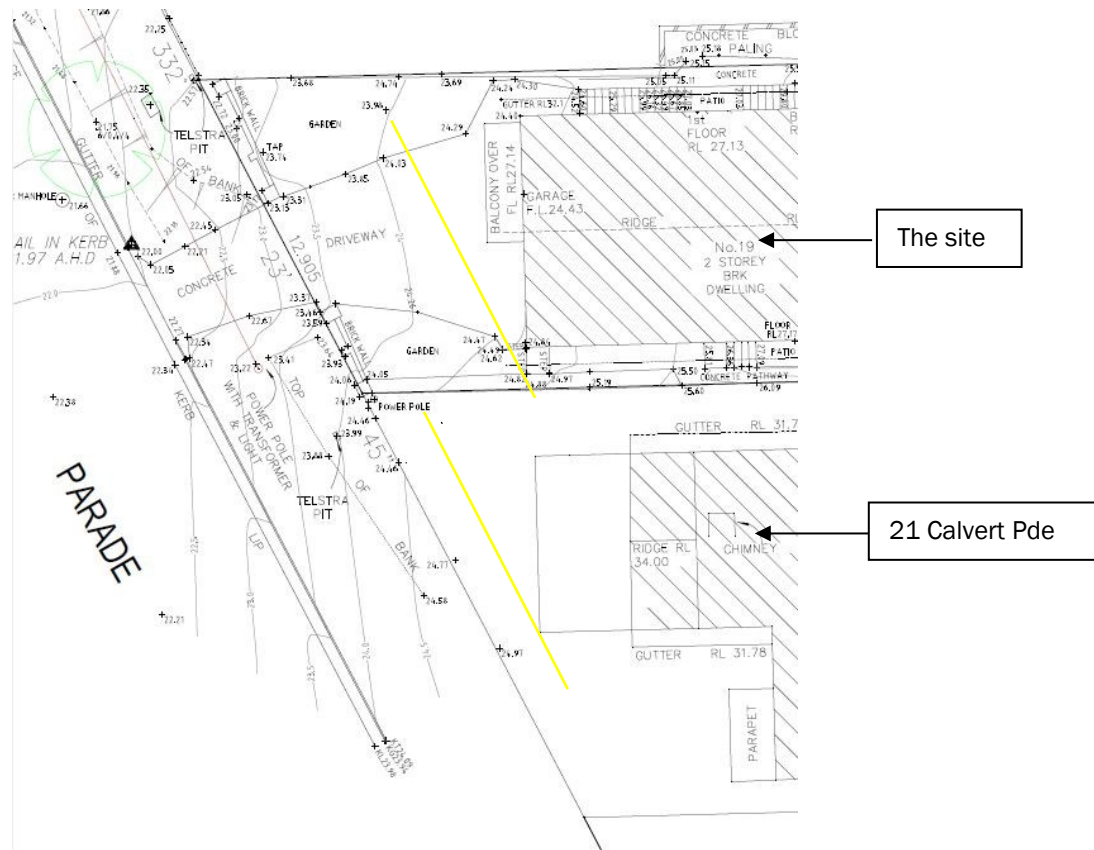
No. 21 Calvert Parade's garage extends forward of the front building alignment (excerpt of the site survey). The subject site is set further back from the street
